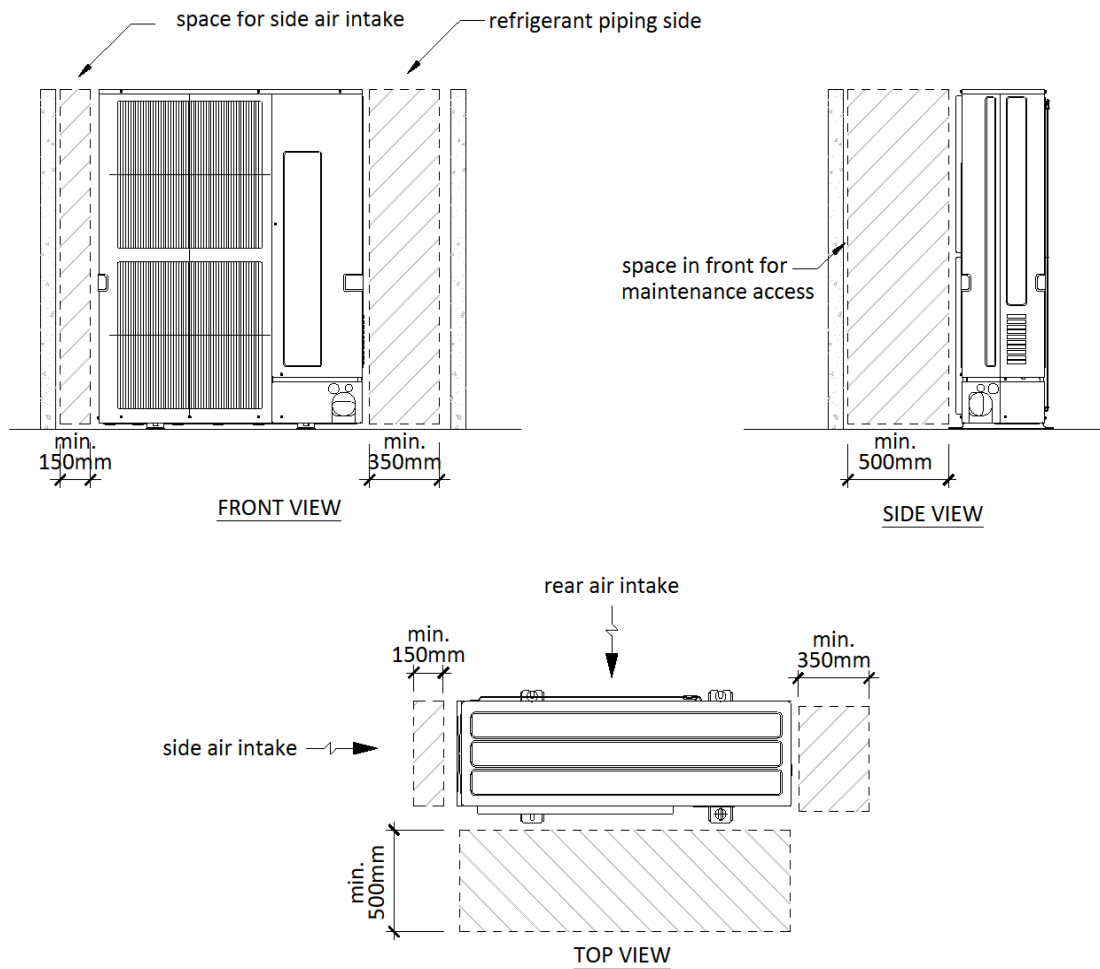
Space requirement for single VRF outdoor installation (side discharge)
